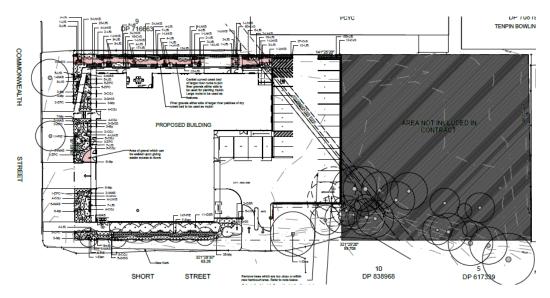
Extract of the Landscape Plan (Source: Outscape Landscape Architects)
